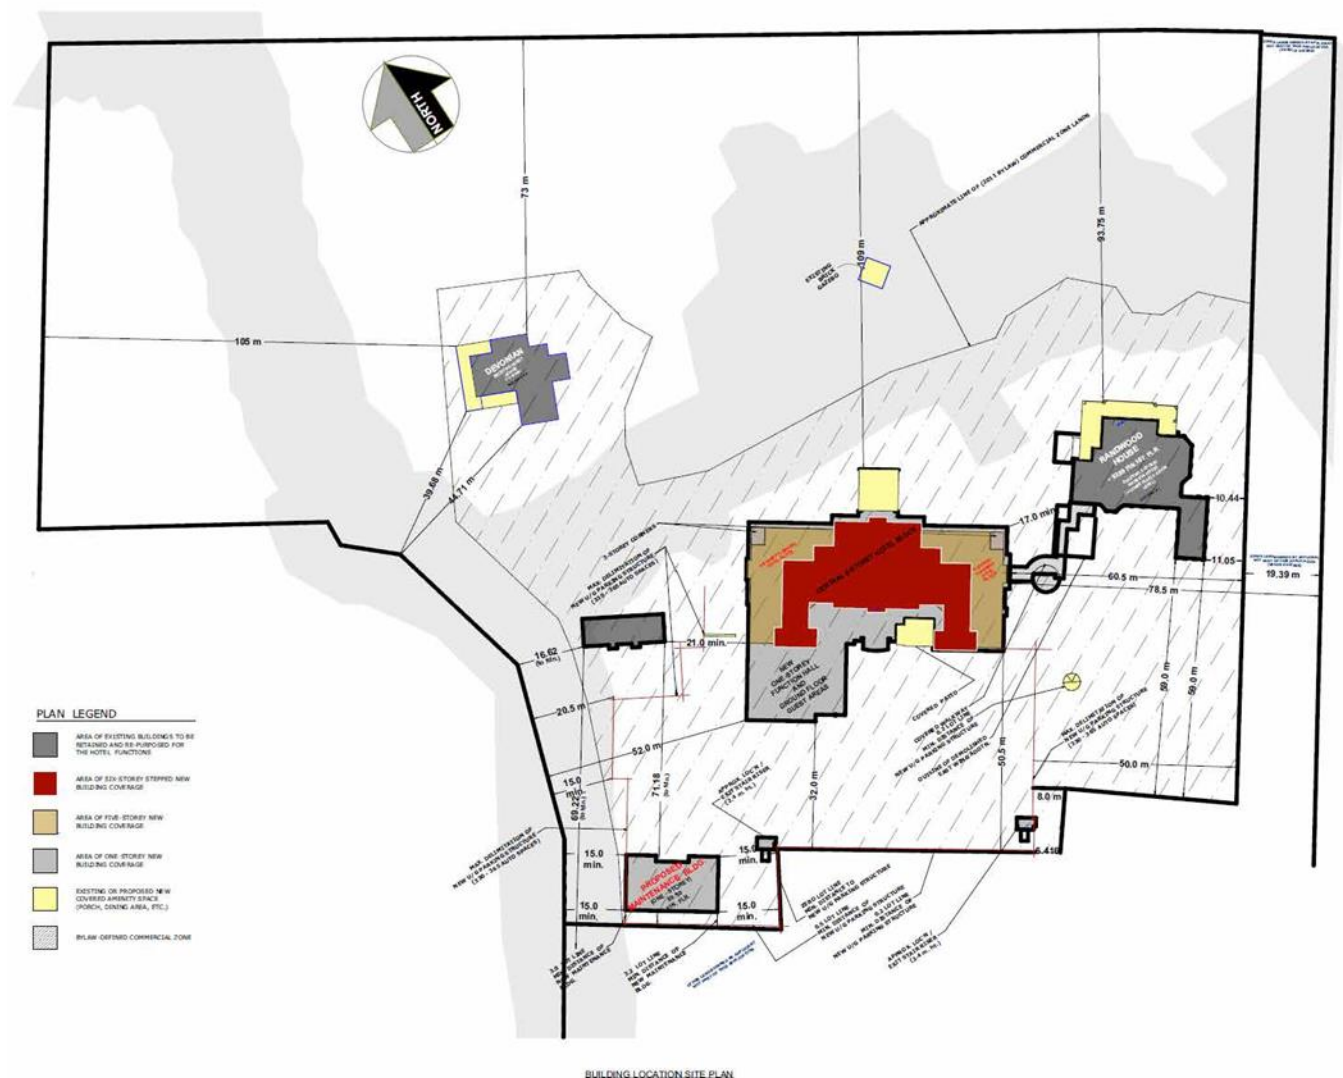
reduced image of submitted setback plan showing ample distances of new hotel block (red) and ground floor conference centre plinth (grey) from the existing property lines and distances internally away from the Randwood mansion and other buildings on the site
